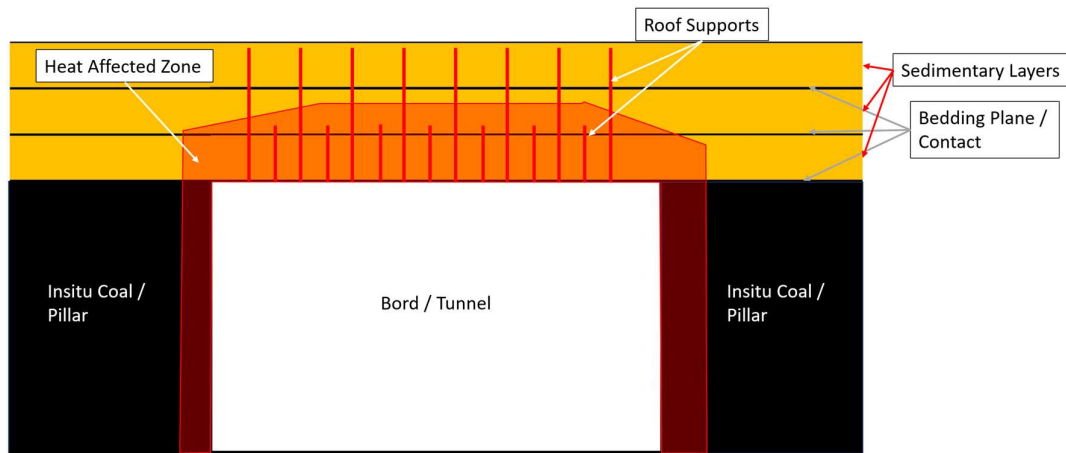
Typical cross section of an underground coal tunnel as part of Bord and Pillar mining, showing a geology cross-section and heat affected zone
